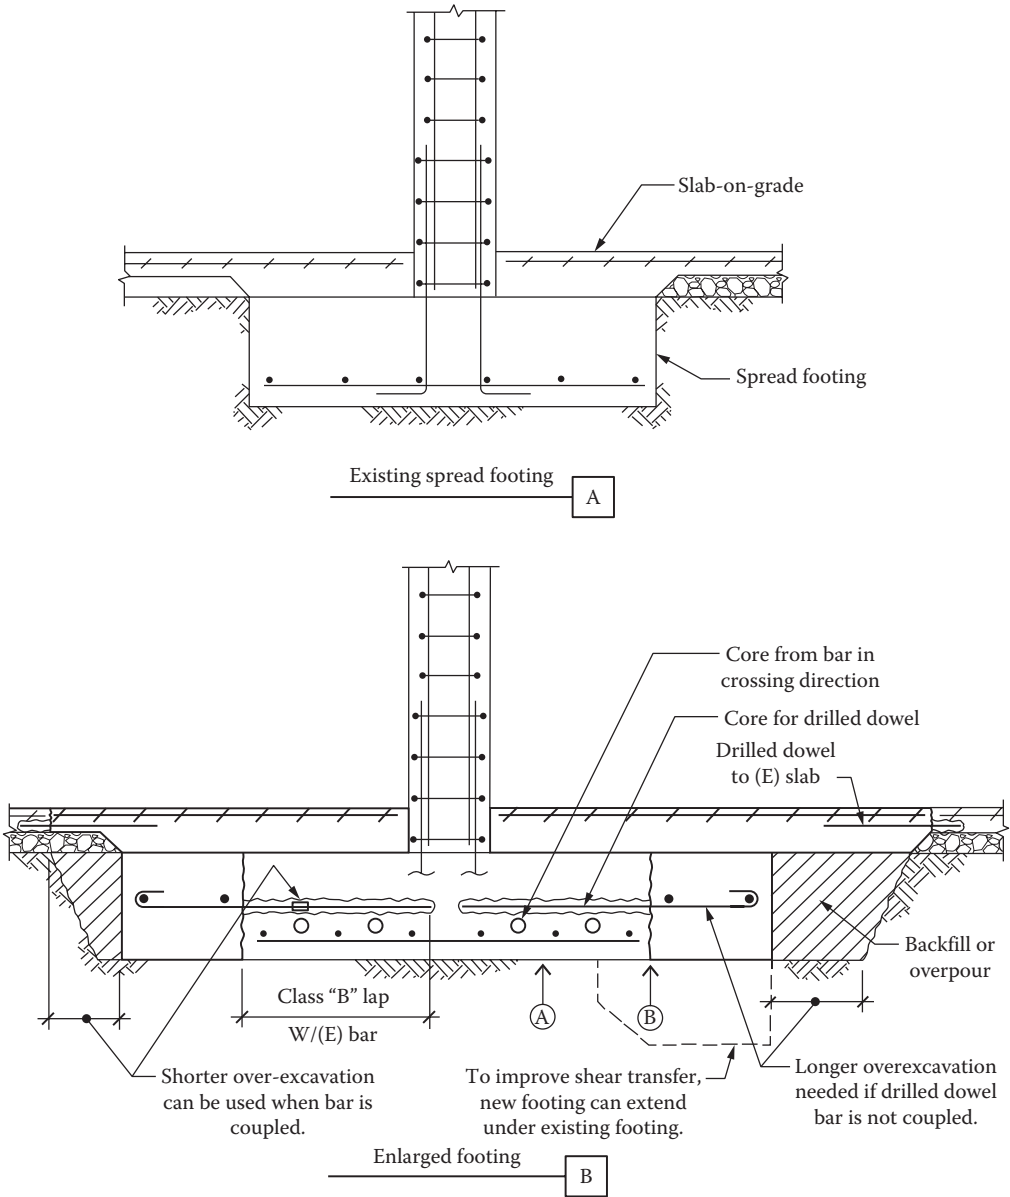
Enlarge existing spread footing. *Note:* 1. Establish existing layers and organize with new bars so existing bars are not cut. 2. Hole for bar without coupler can be smaller. 3. Check new bar capacity at location B. Check existing bar capacity at location A.
